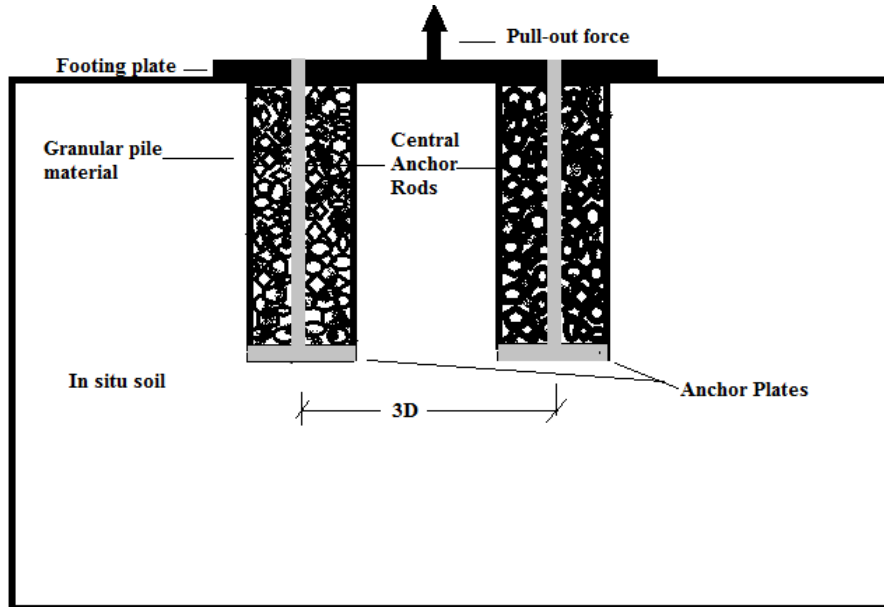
Concept of the granular anchor pile (GAP) foundation system
